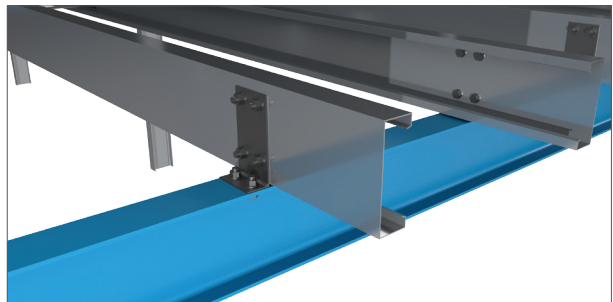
Detail of thin-walled floor beam oversailing connection to a girder of hot-rolled IPE, HEA or HEB section
